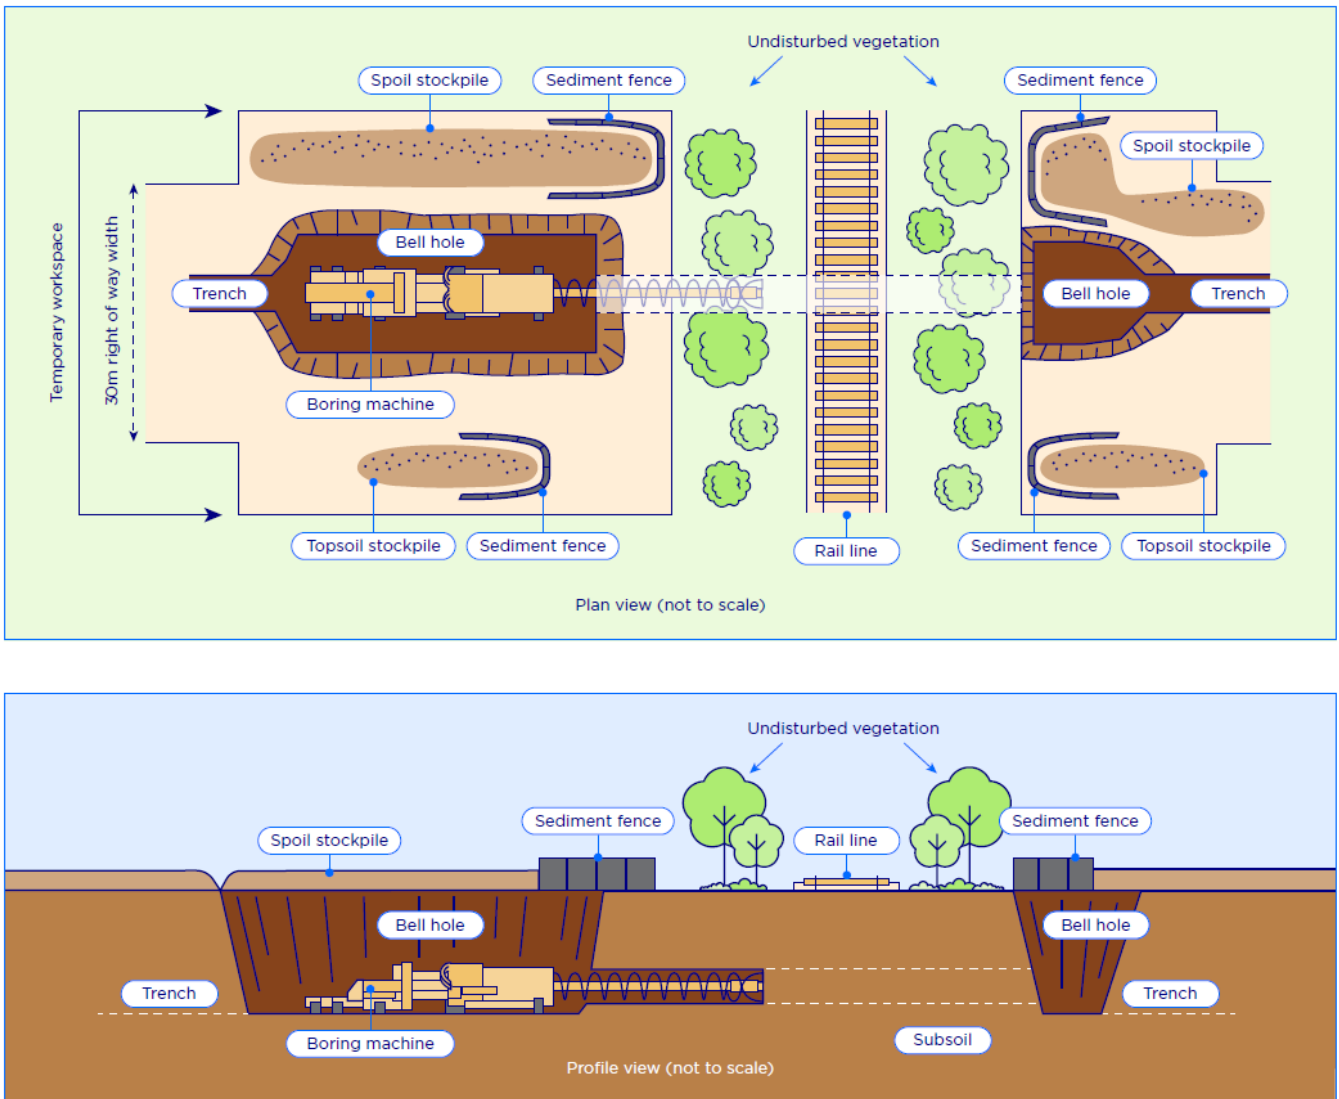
Other trenchless construction methods – indicative workspace layout
